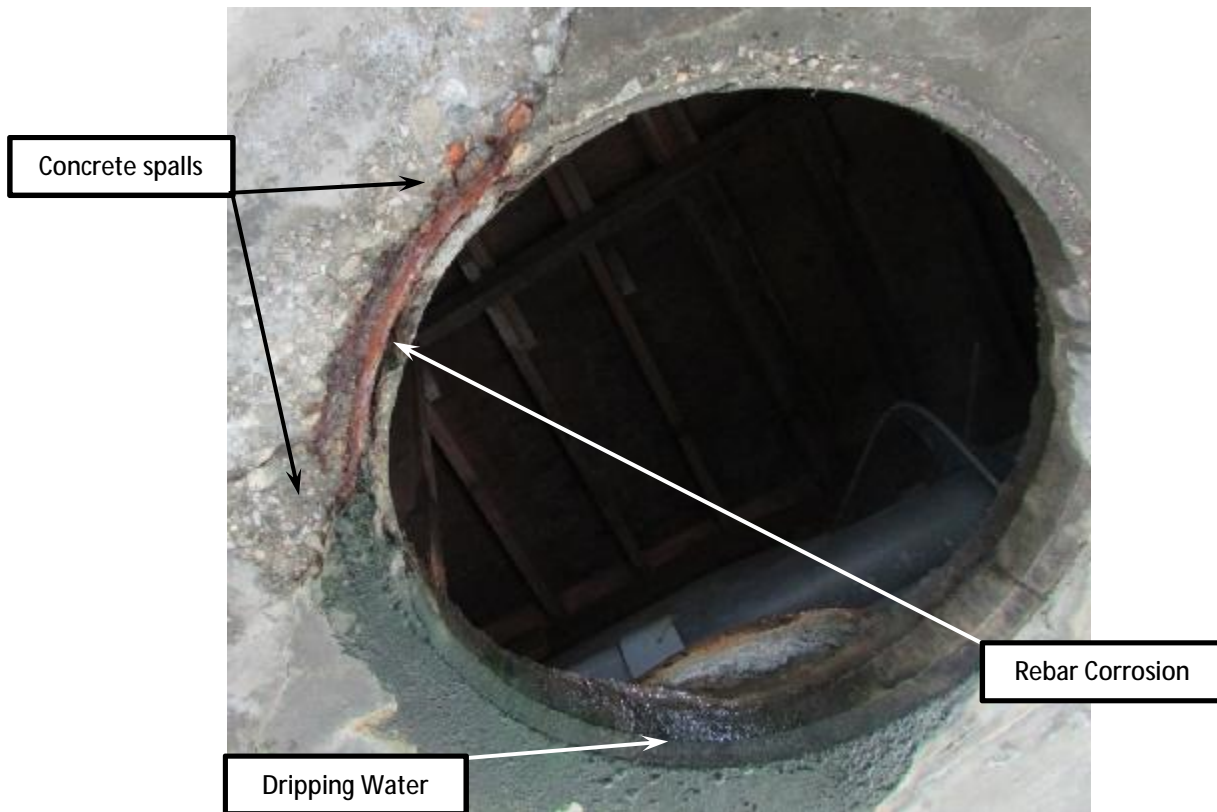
Spalling around the soffit opening as well as rebar corrosion.
